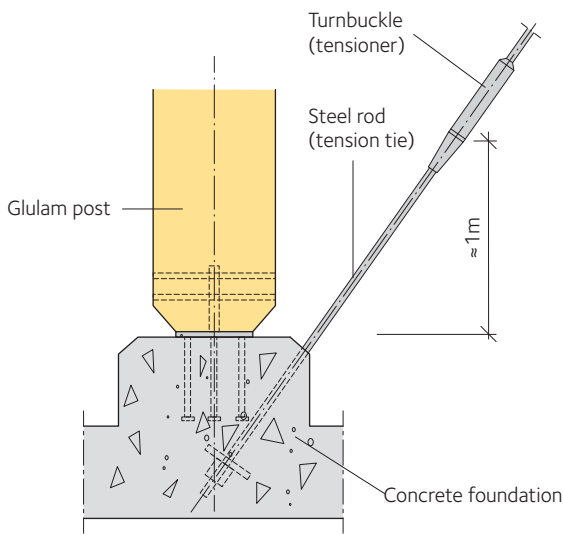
Example of connecting a diagonal wind brace to the foundation. A turnbuckle (tensioner) allows for the adjustment of the wind brace.
